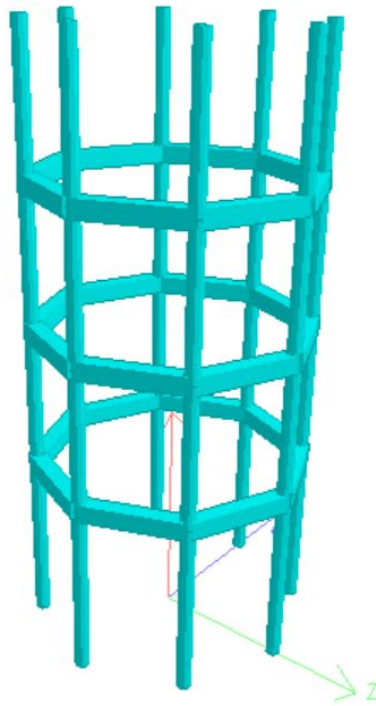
Supporting structure of the elevated water tank modelled on STAAD Pro
